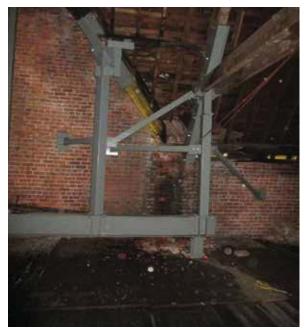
Floor and wall damage and steel stabilization in attic (SGH 2019)
